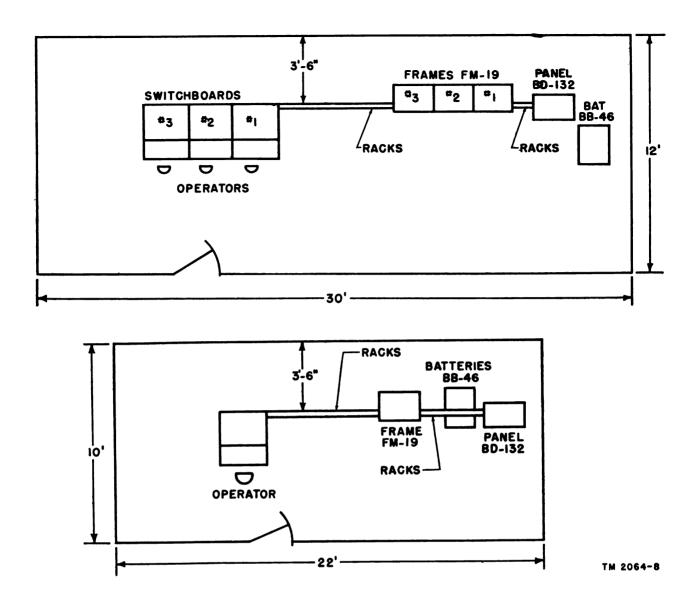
Spacing requirements, typical installations: Panel BD-132 and associated equipment, three-switchboard grouping (above), single-switchboard grouping (below).
